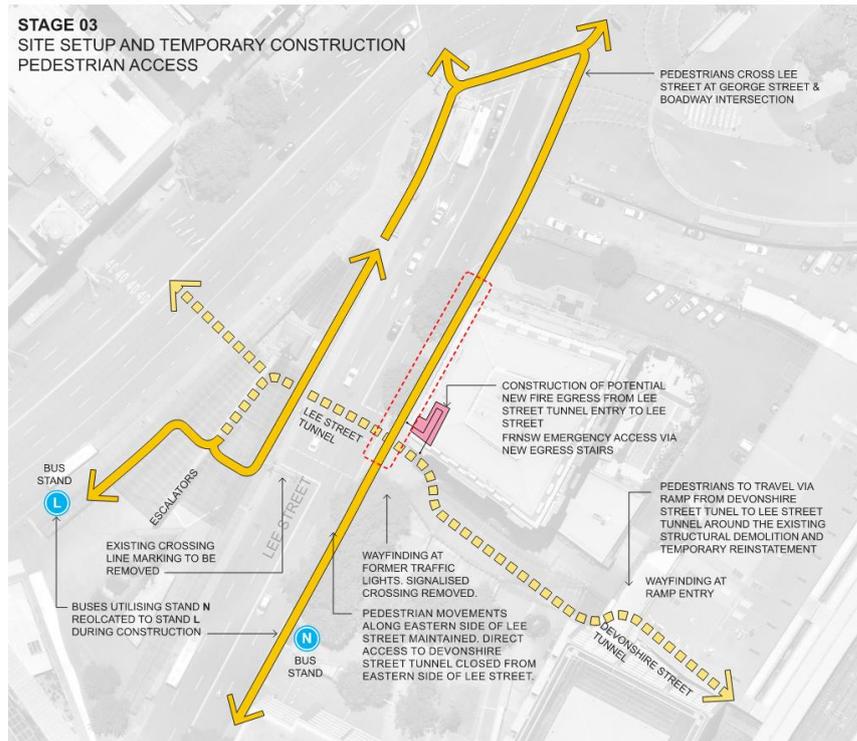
Stage 3 : Site setup and pedestrian access construction (Construction)
